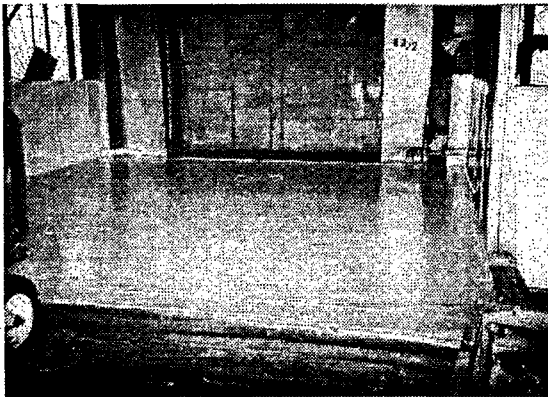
Concrete loading dock floor in the high bay after spray coating with Polibrid 705.
